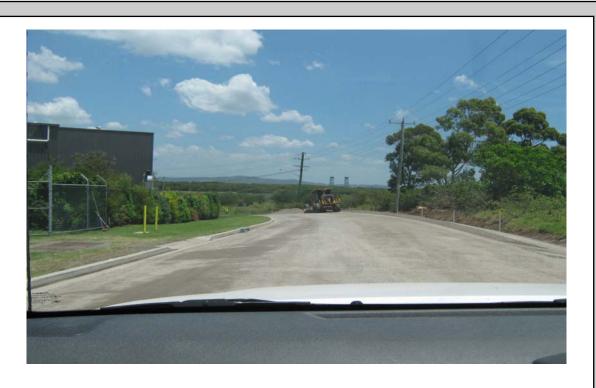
Section of Reconstructed Old Punt Road. Asphalt Surfacing required for Completion.
